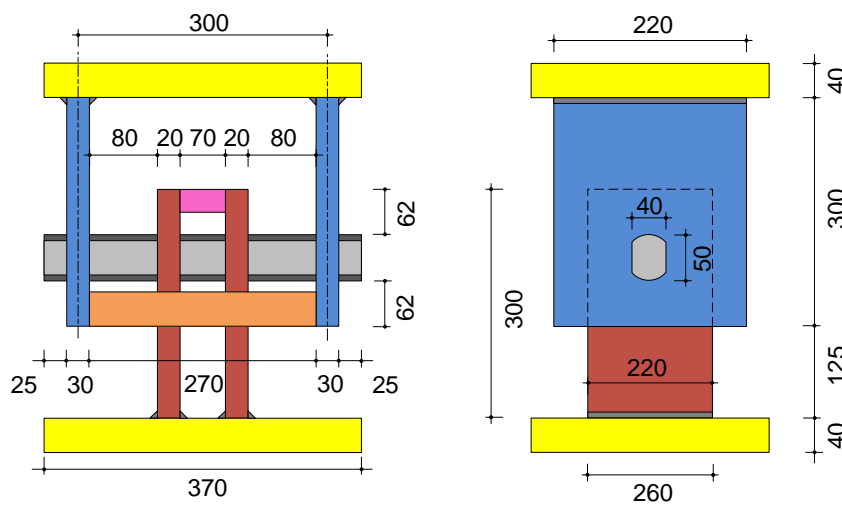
DRBrC current configuration: (a) top view and (b) side view. Dimensions in *mm*.
